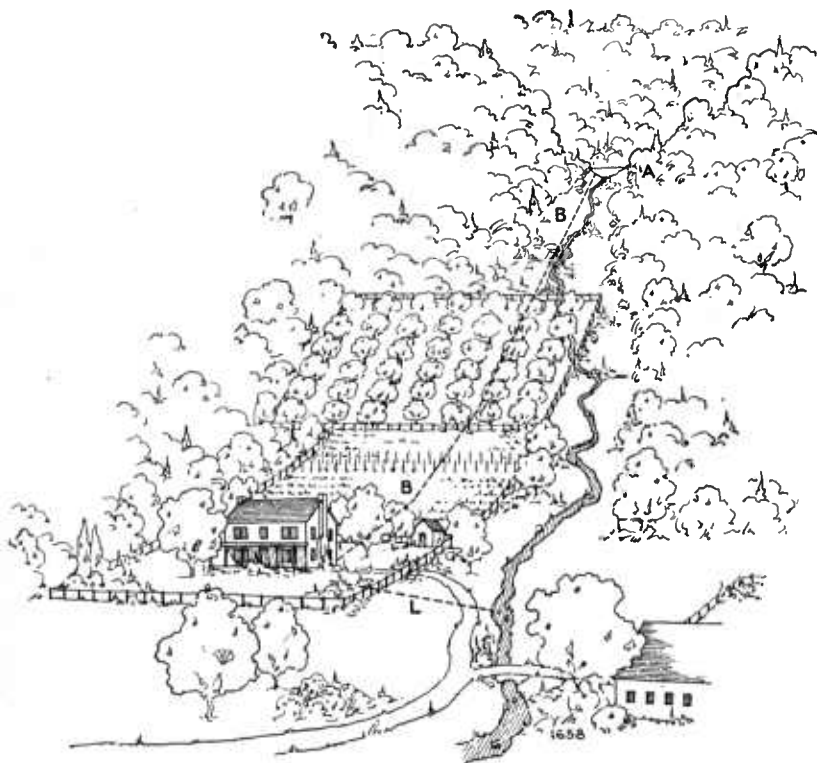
General view of high-head water power plant. A, dam; B, underground supply pipe line; L, underground tail-water pipe line
